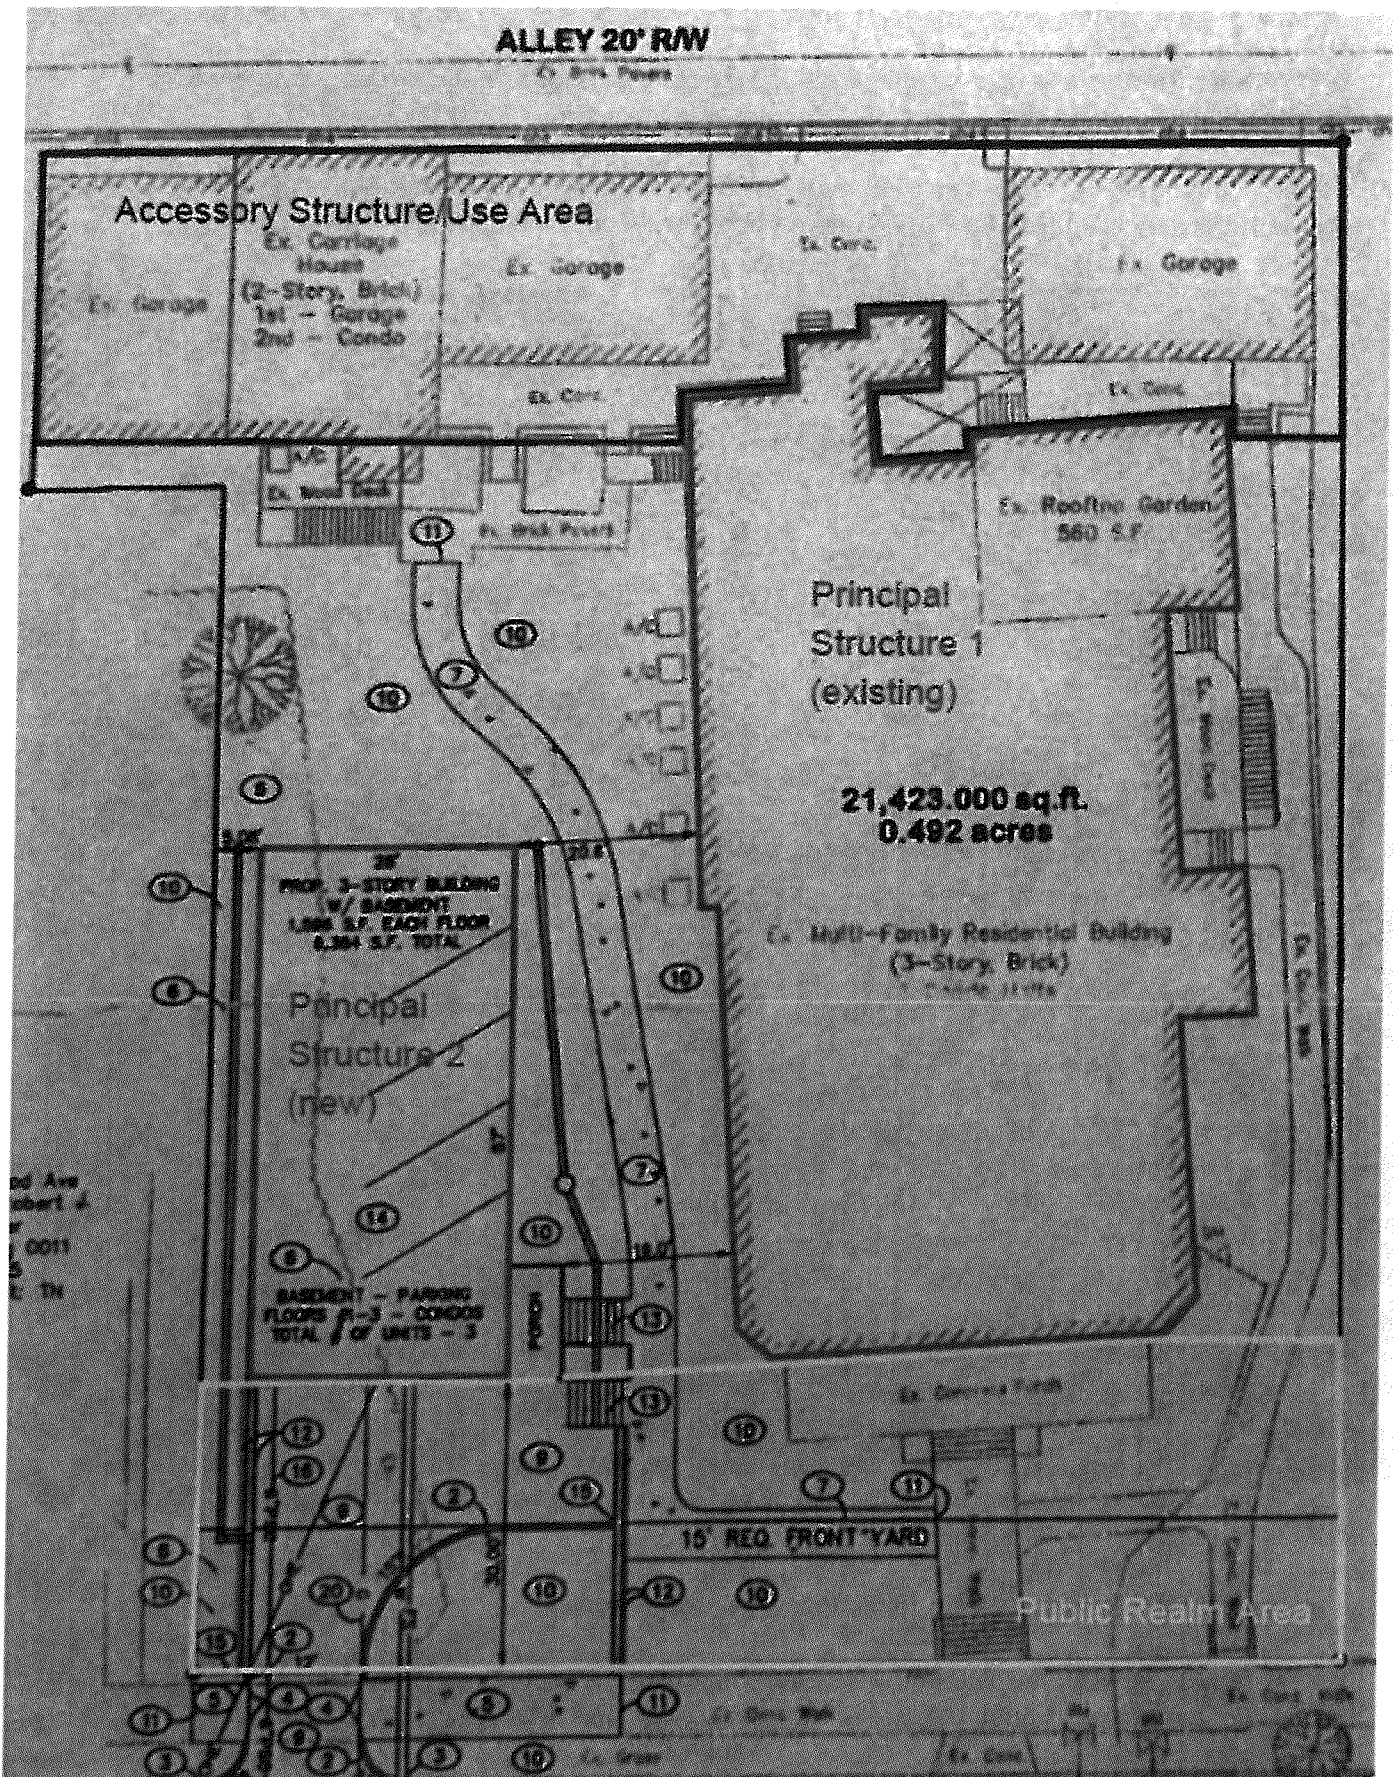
(Based on excerpt of 2013 building permit application document C3 - Site Layout Plan)
